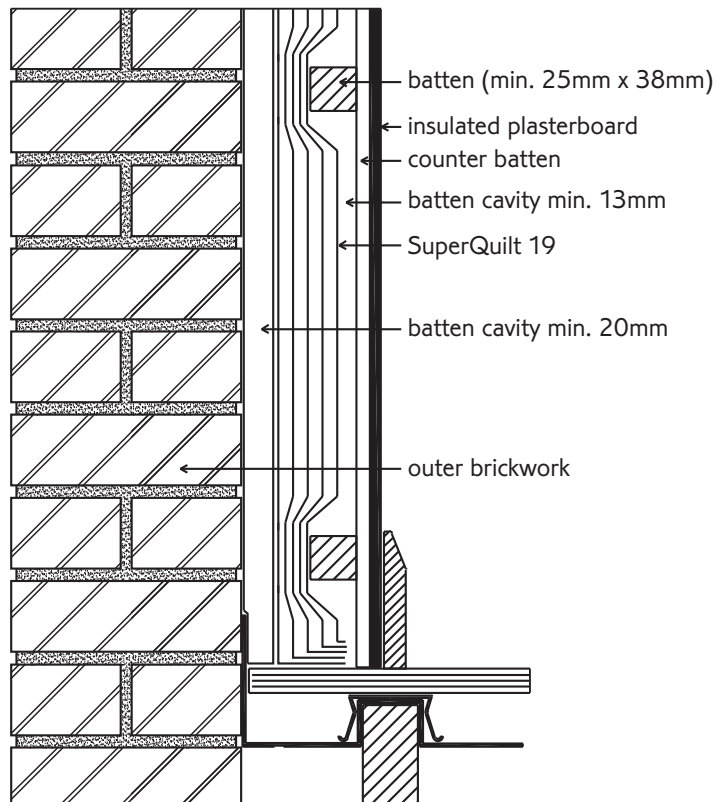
Typical masonry cavity wall application, with dry lining and SuperQuilt 19
